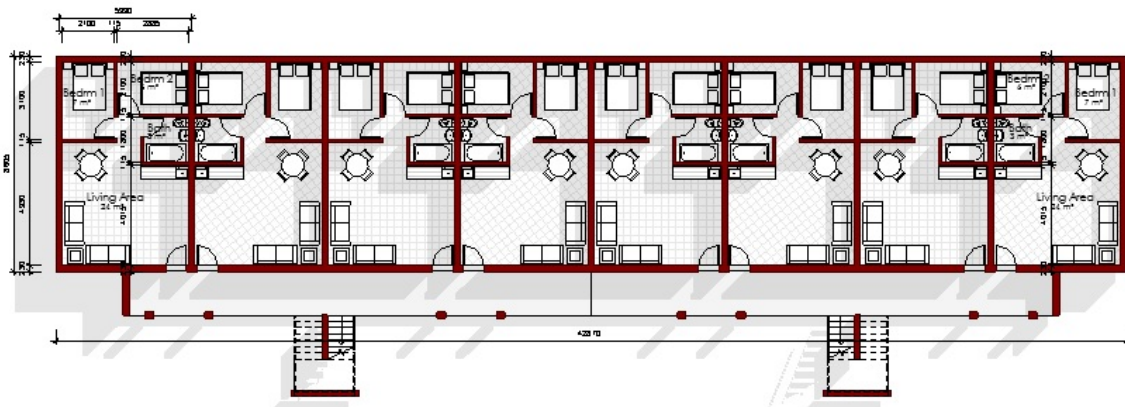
Typical 45m² Unit Floor Plan (8 Units)
